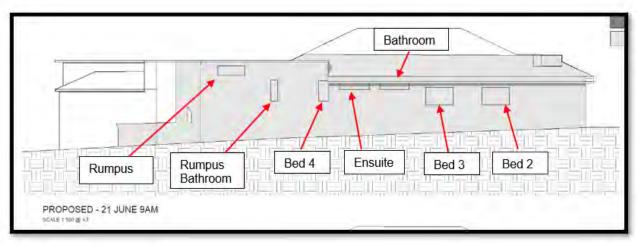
Elevational plan detailing overshadowing to No. 38 Olive Street at 9am on June 21.
